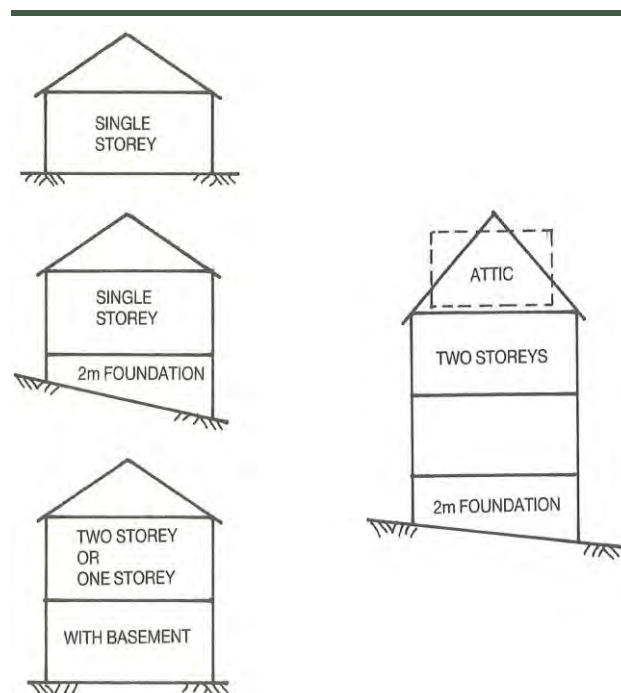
Examples of designing to NZS 4229 are shown in Section 4.2 'Reinforced Masonry'
